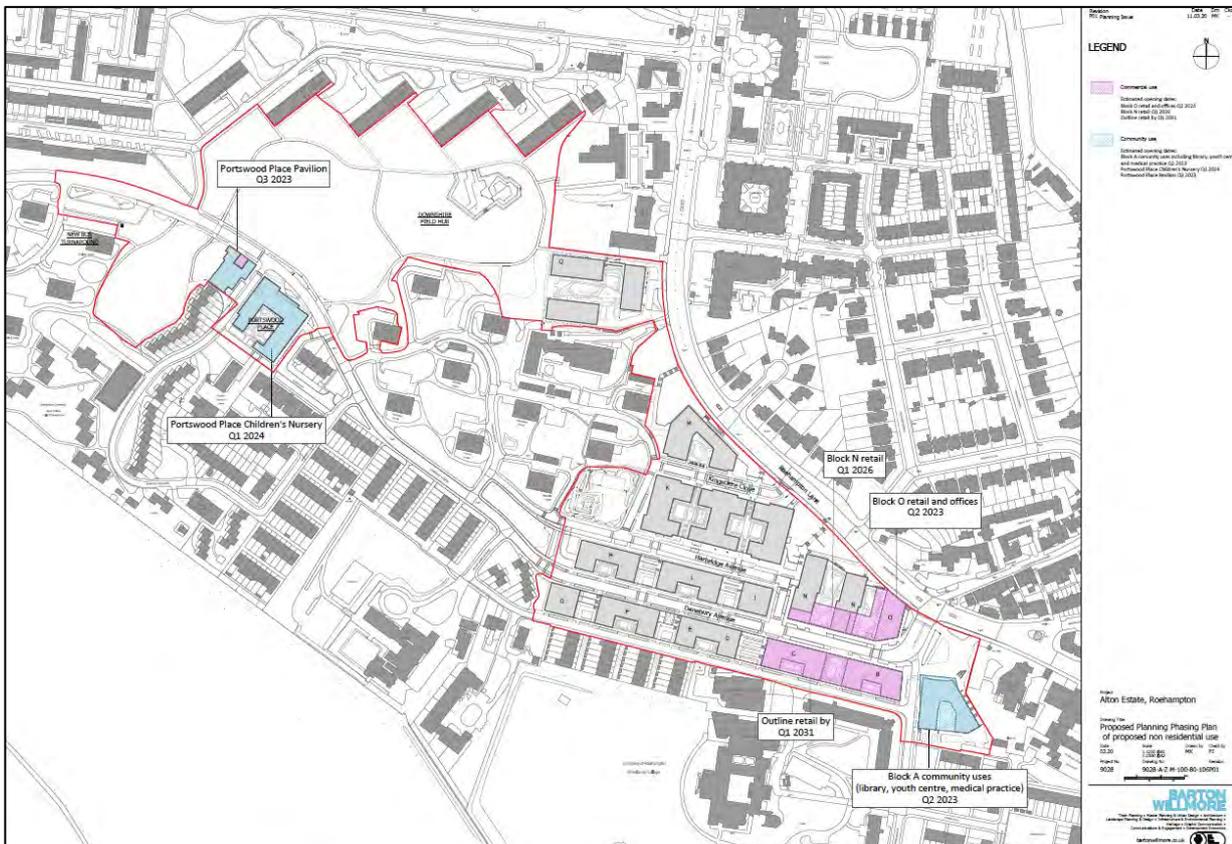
PROPOSED NON-RESIDENTIAL USES PHASING PLAN
